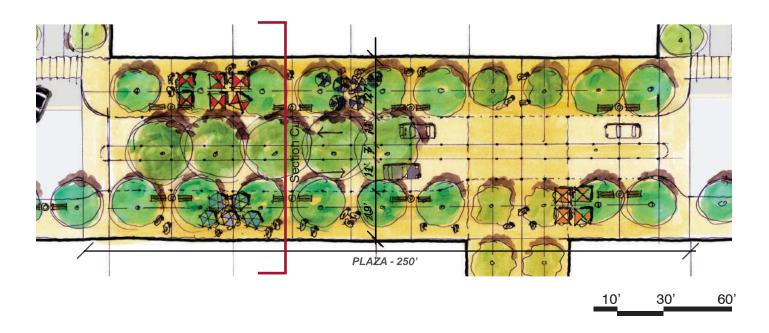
Concept Plan of the Santa Cruz Avenue Central Plaza
